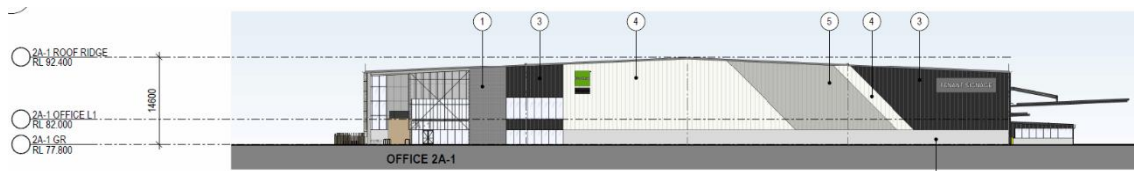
Warehouse 2A-1 West Elevation (Source: SBA Architects)
